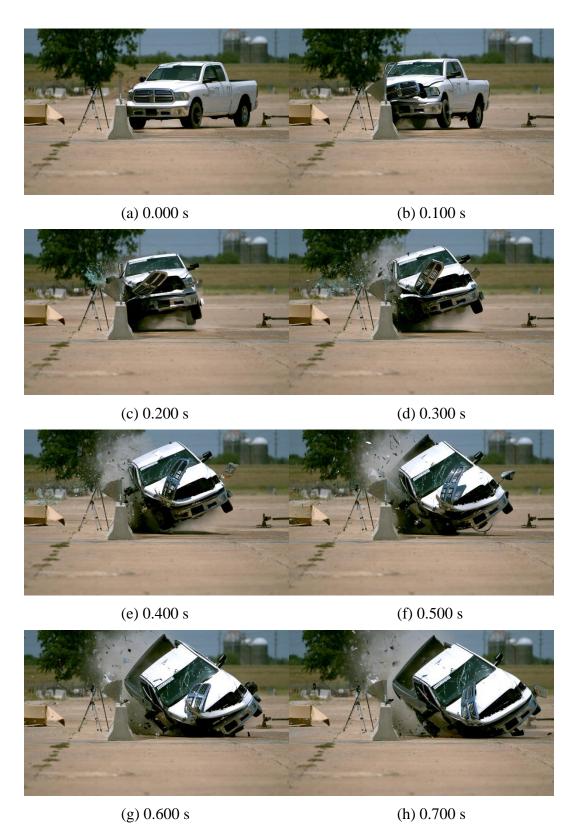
Sequential Photographs for Test No. 440822-01-4 (Frontal Views).
